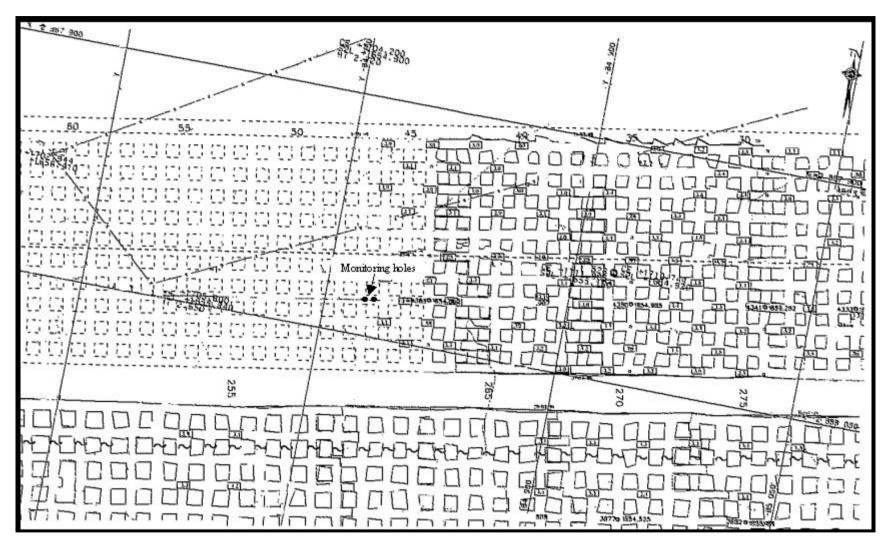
Section plan Colliery 'A' Site 2 (not scaled)
